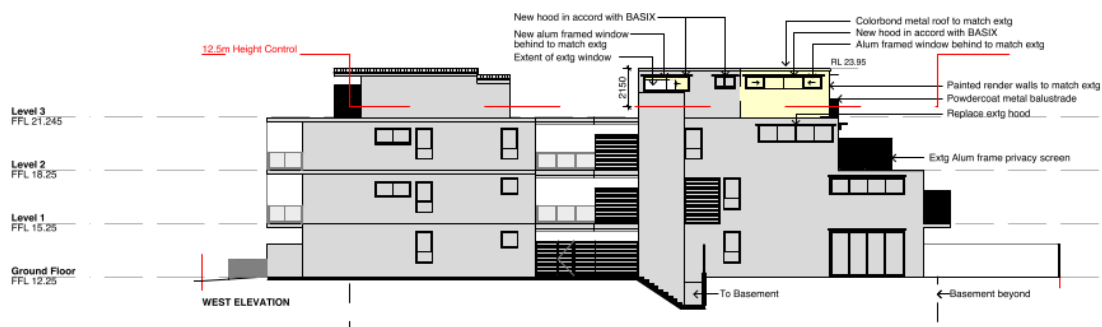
North-west elevation showing the proposed addition in yellow (Source: Ken Powell Architects)
